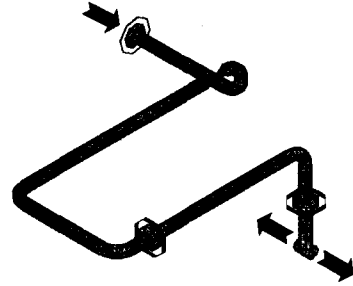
Isometric Drawing Carried out by Isometric Viewer
